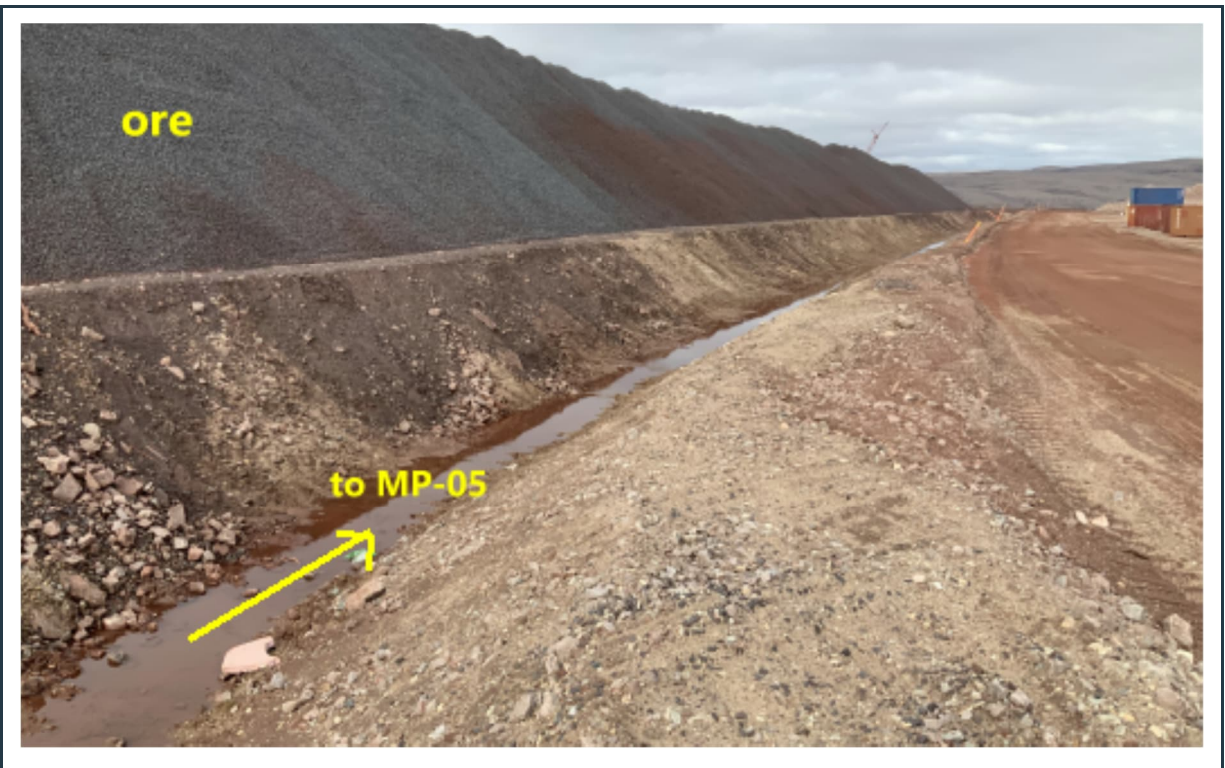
View of the "east" surface water collection ditch adjacent to the ore storage, draining to the MP-05 pond.
